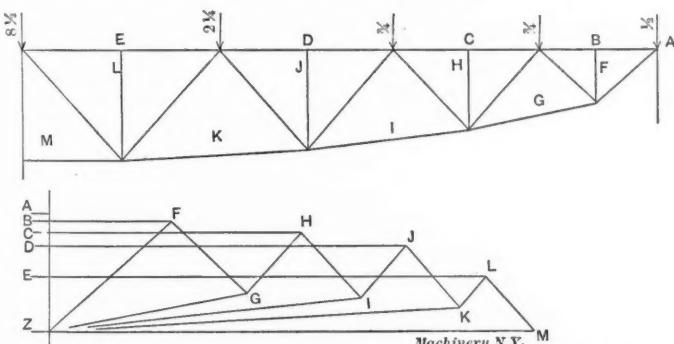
Length of Bays at End of Fish-bellied Girders Shortened to equalize Stresses in Struts
